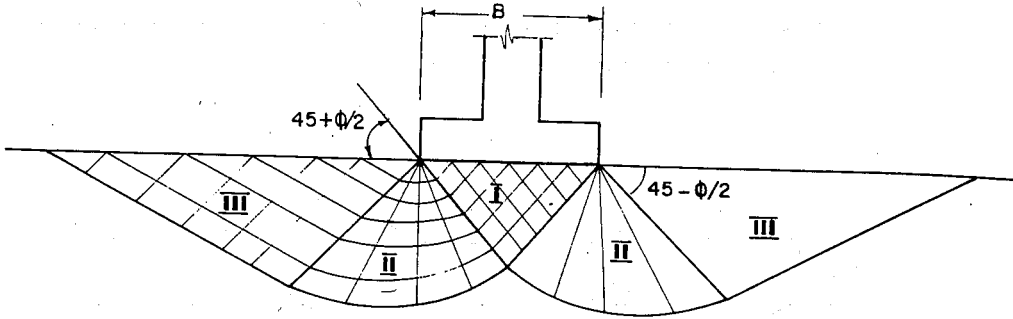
Failure zones below smooth base footing loaded at ground level.
